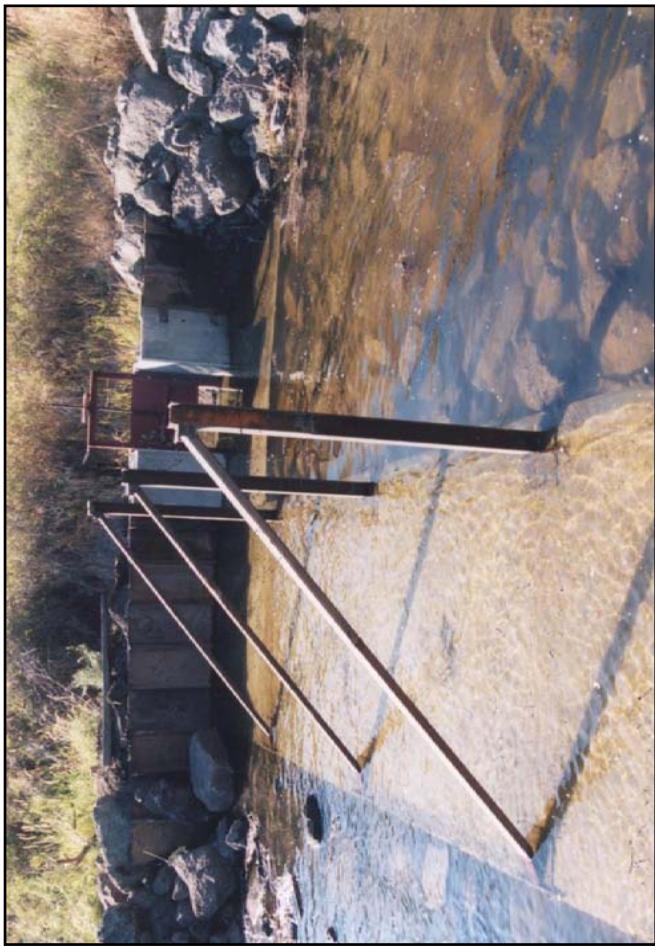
Typical permanent diversion, lay flat stanchions up, no flashboards
